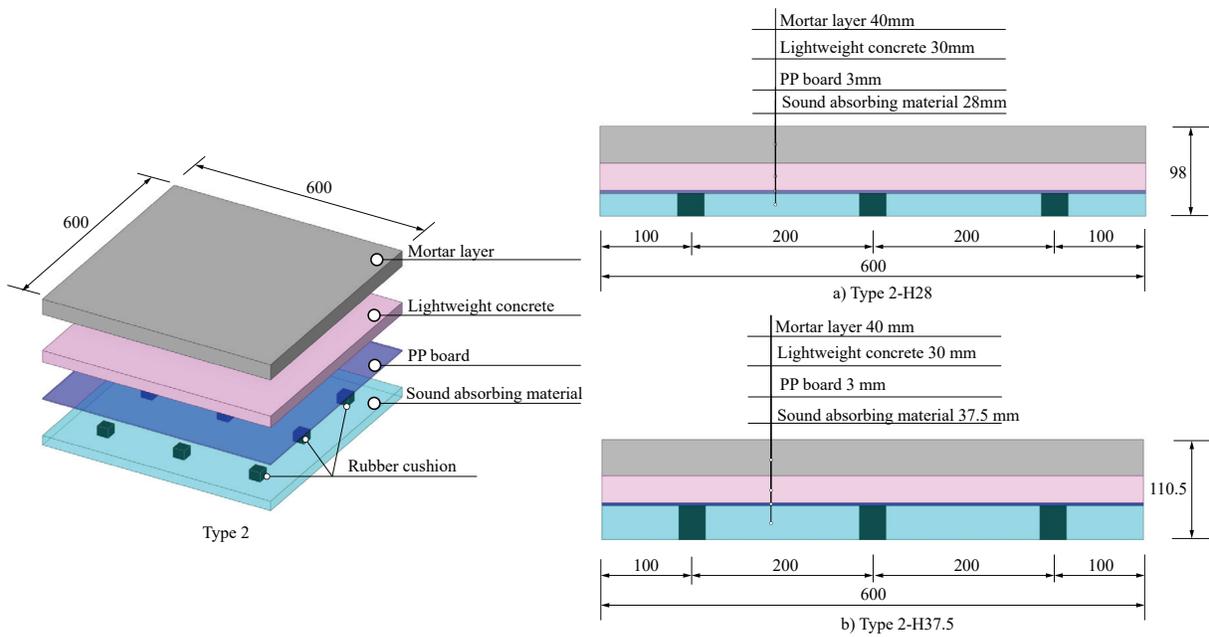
Configuration and cross-section of a module of the tested floating floor Type 2.
